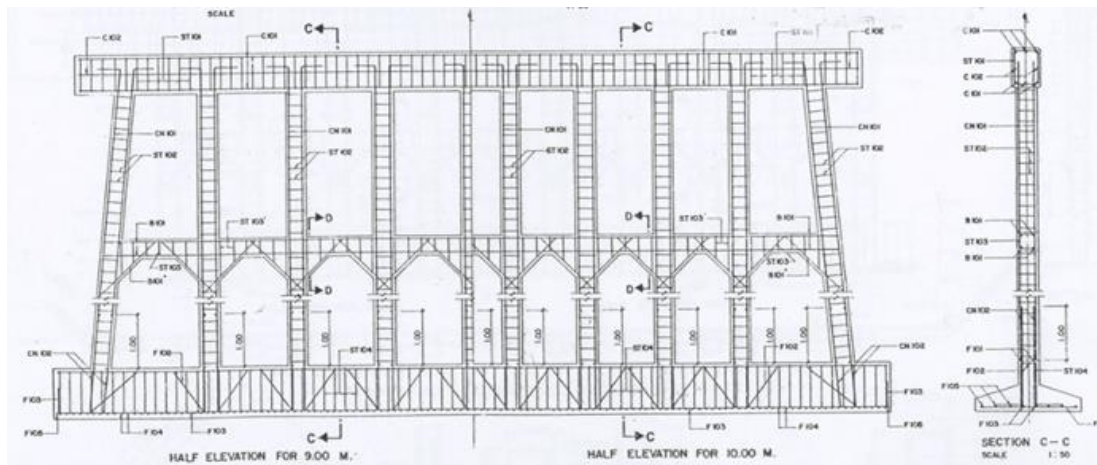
Reinforcement detail of pier for 9.0m and 10.0m span (DOH, 1994)
